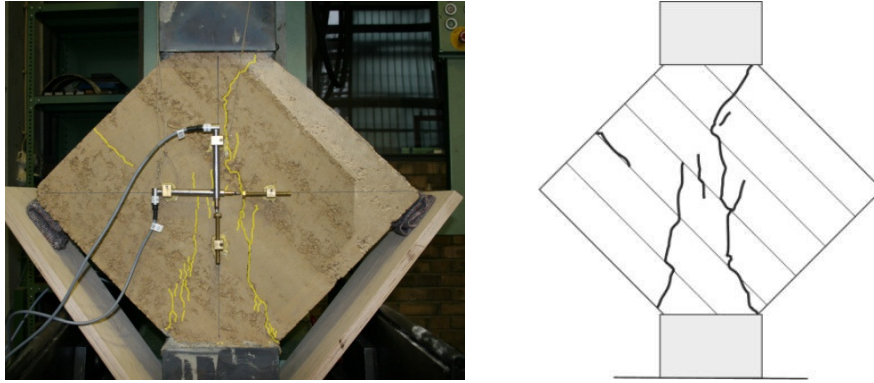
Crack pattern of a wallet tested under diagonal compression [16].
